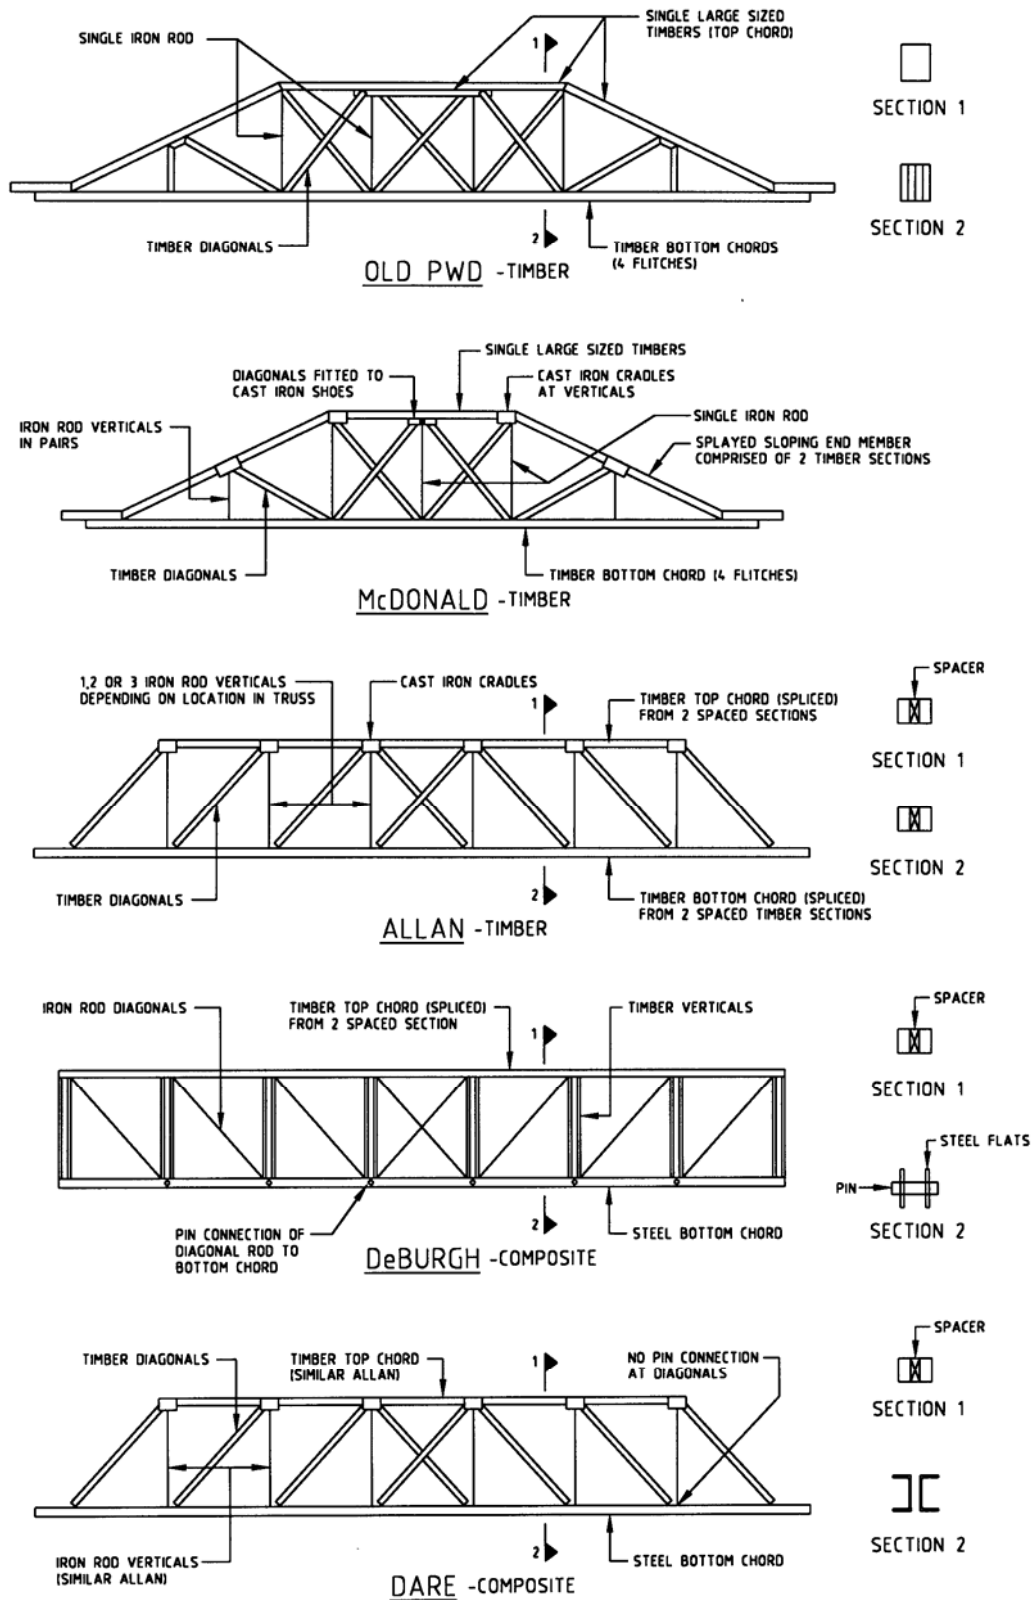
Diagrams of truss types used in NSW timber truss road bridges.
